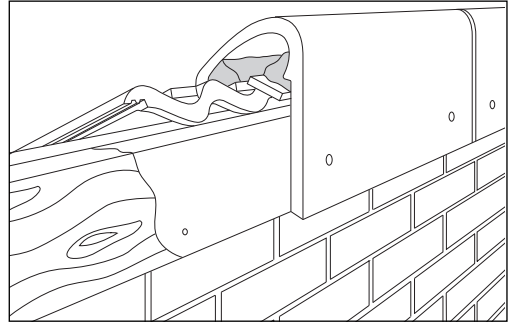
Bedded mono-ridge tile with two screw fixings (concrete)
